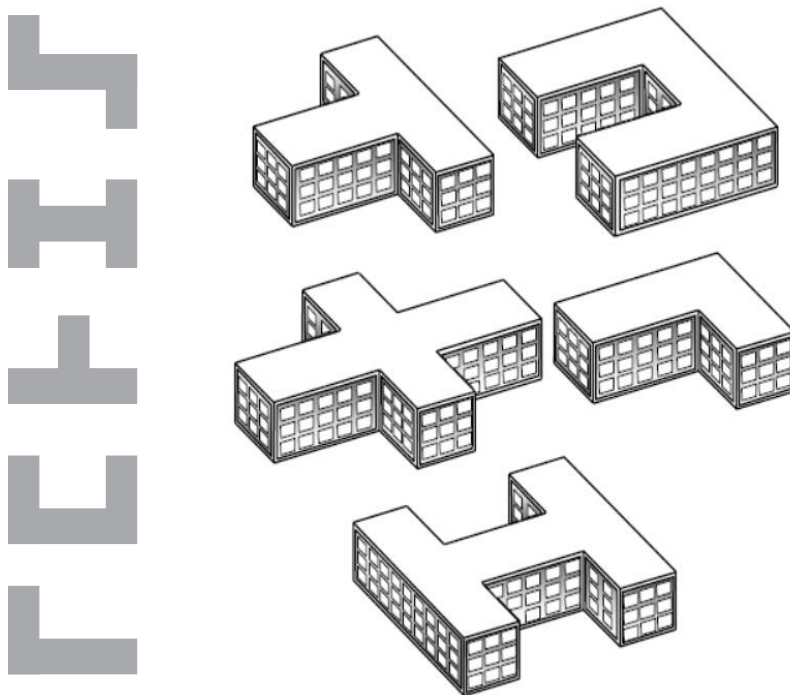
"U", "H", "L", "T" and "anchor" shaped plan arrangement of building is unfavourable
